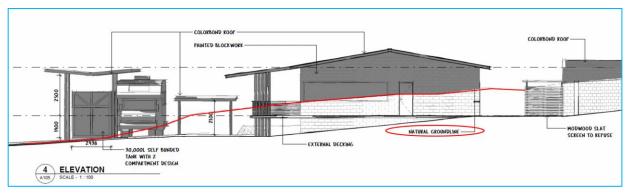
ELEVATIONS PLANS INDICATING THE NATURAL GROUND LINE (SOURCE: SCHEDULE 1 – UPDATED PROPOSAL PLANS)
